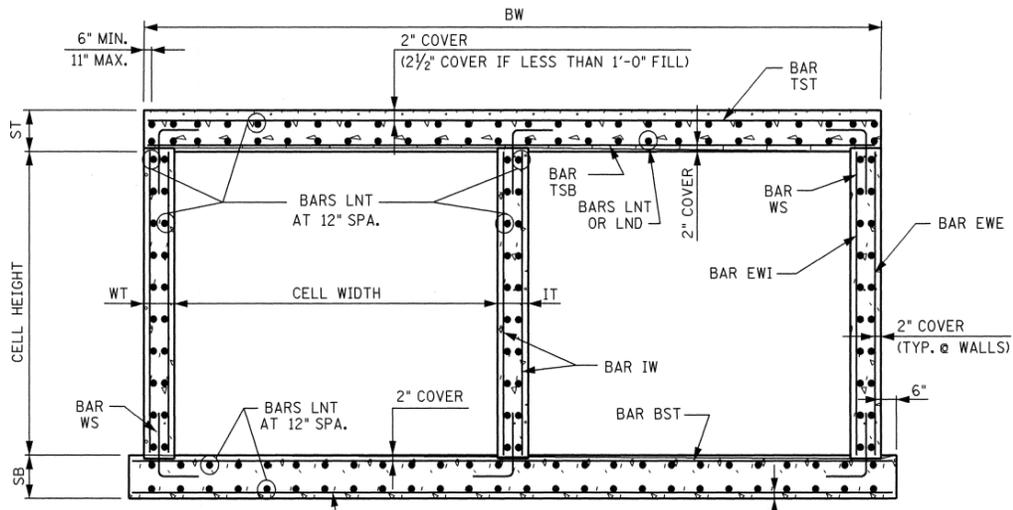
TDOT STD 15 and STD 17 Typical Cross Section
